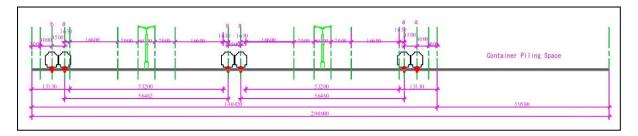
Lamu RFT - Cross Section A-A – Bulk Cargo Loading / Unloading Facilities (JPC study)
